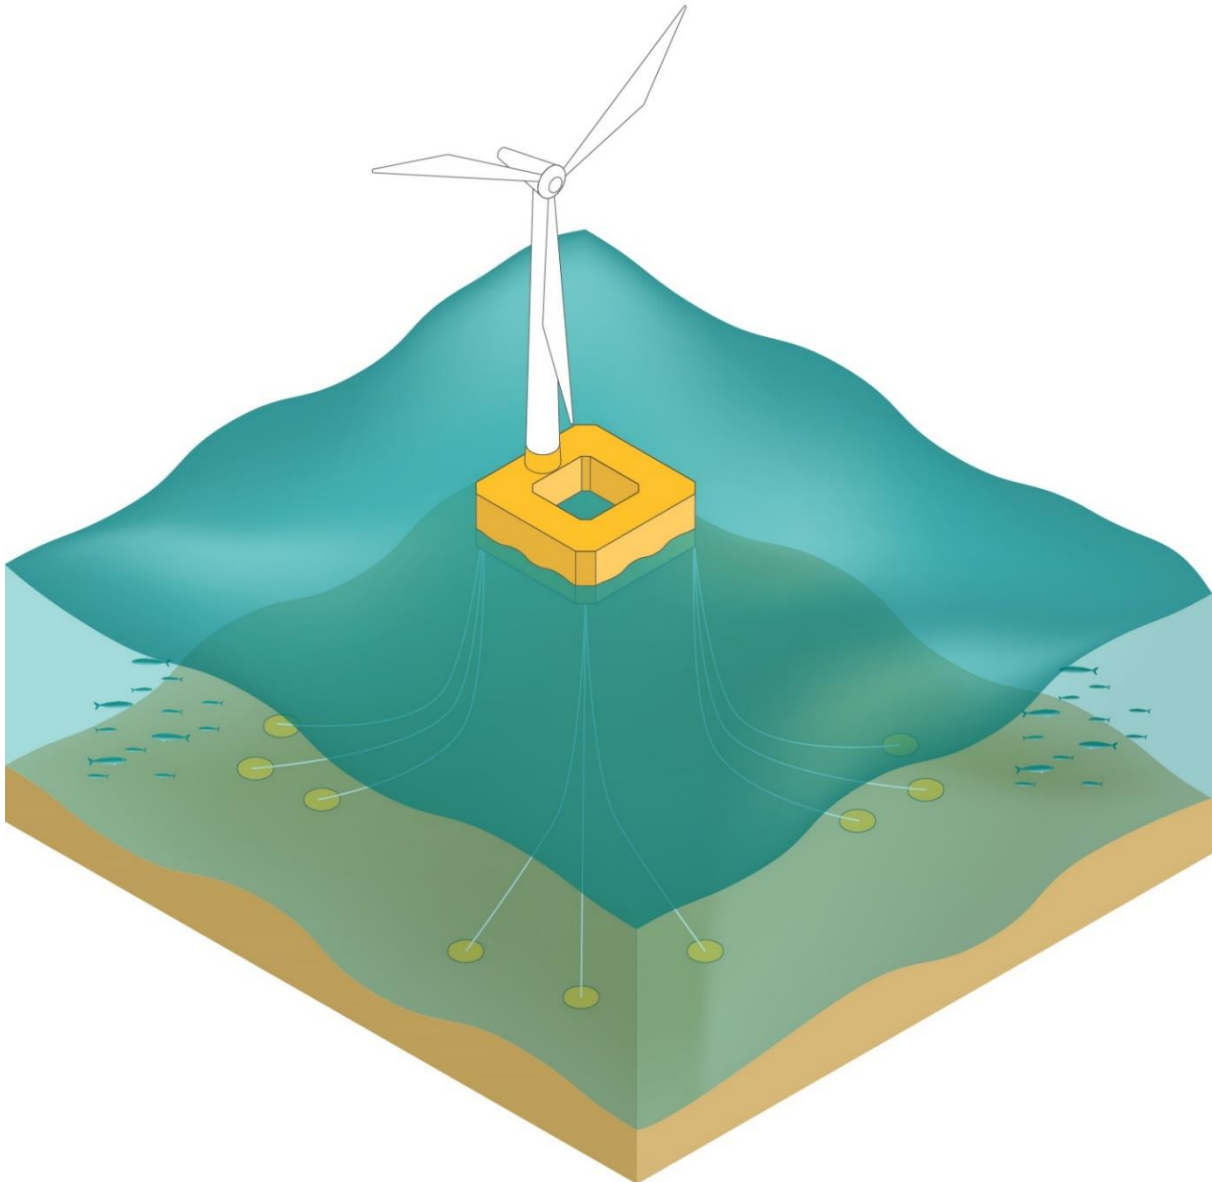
Example of Mooring Configuration for Floating Foundations
